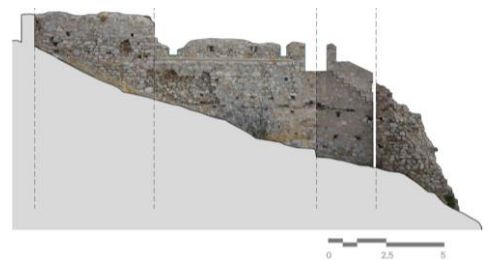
Unfolded elevation of the north wall of the settlement (internal view)
